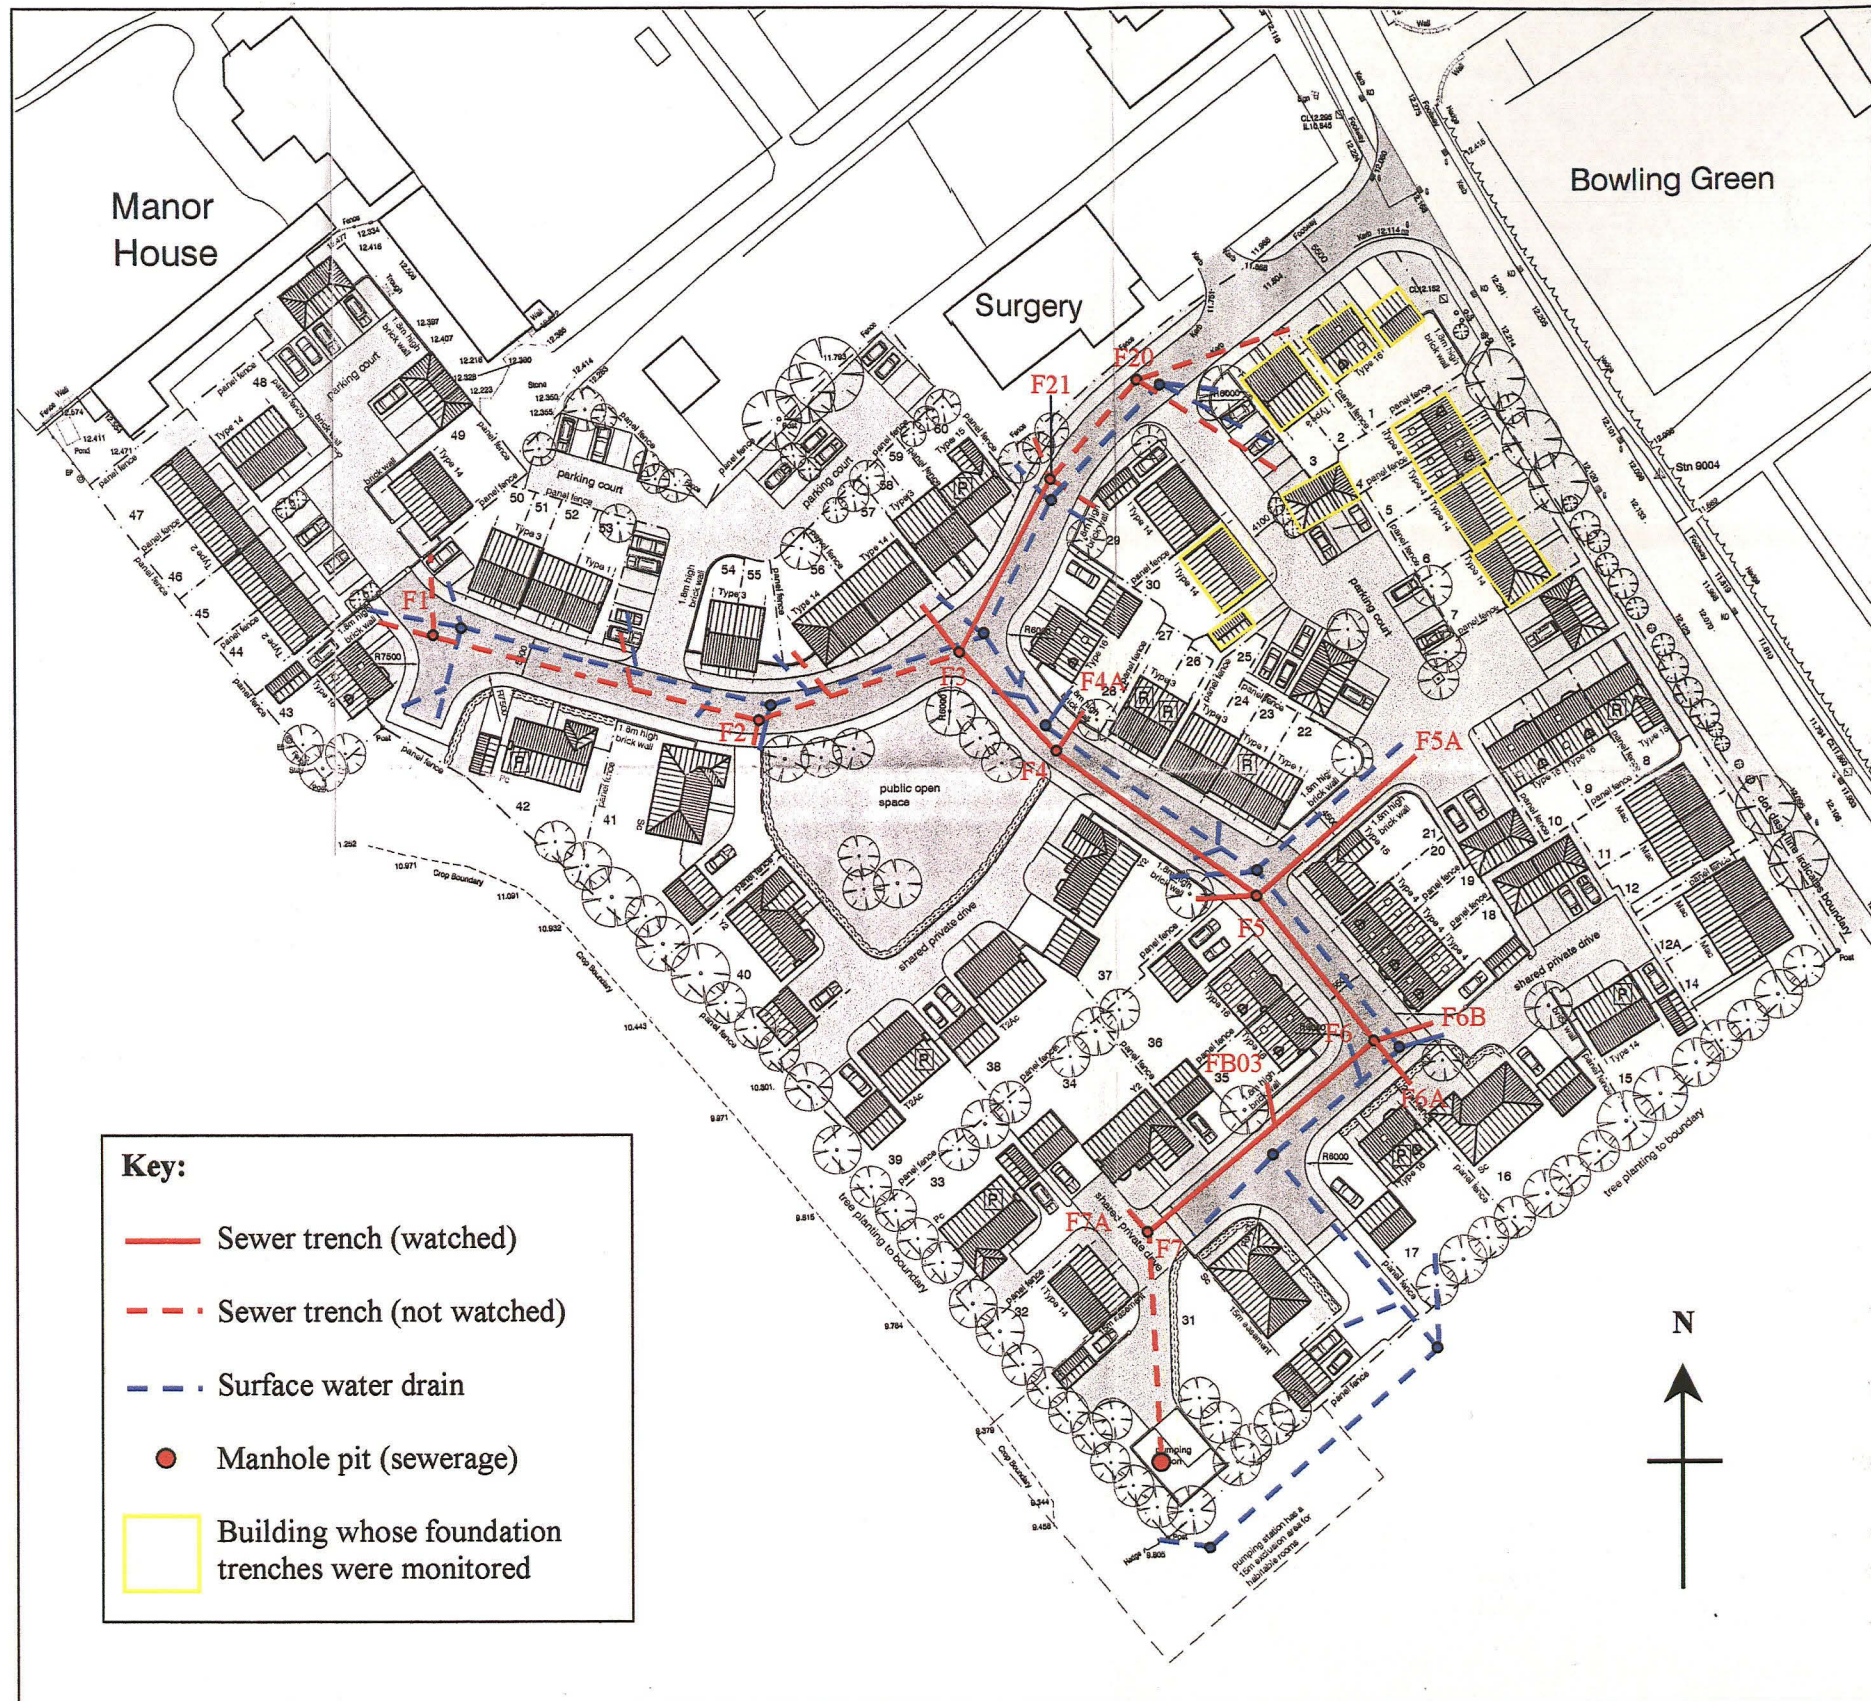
Plan of the proposed development, showing the routes of the sewer trenches (red) and surface water drain trenches (blue), and the buildings whose foundation trenches were monitored (yellow). Scale 1:1000.
